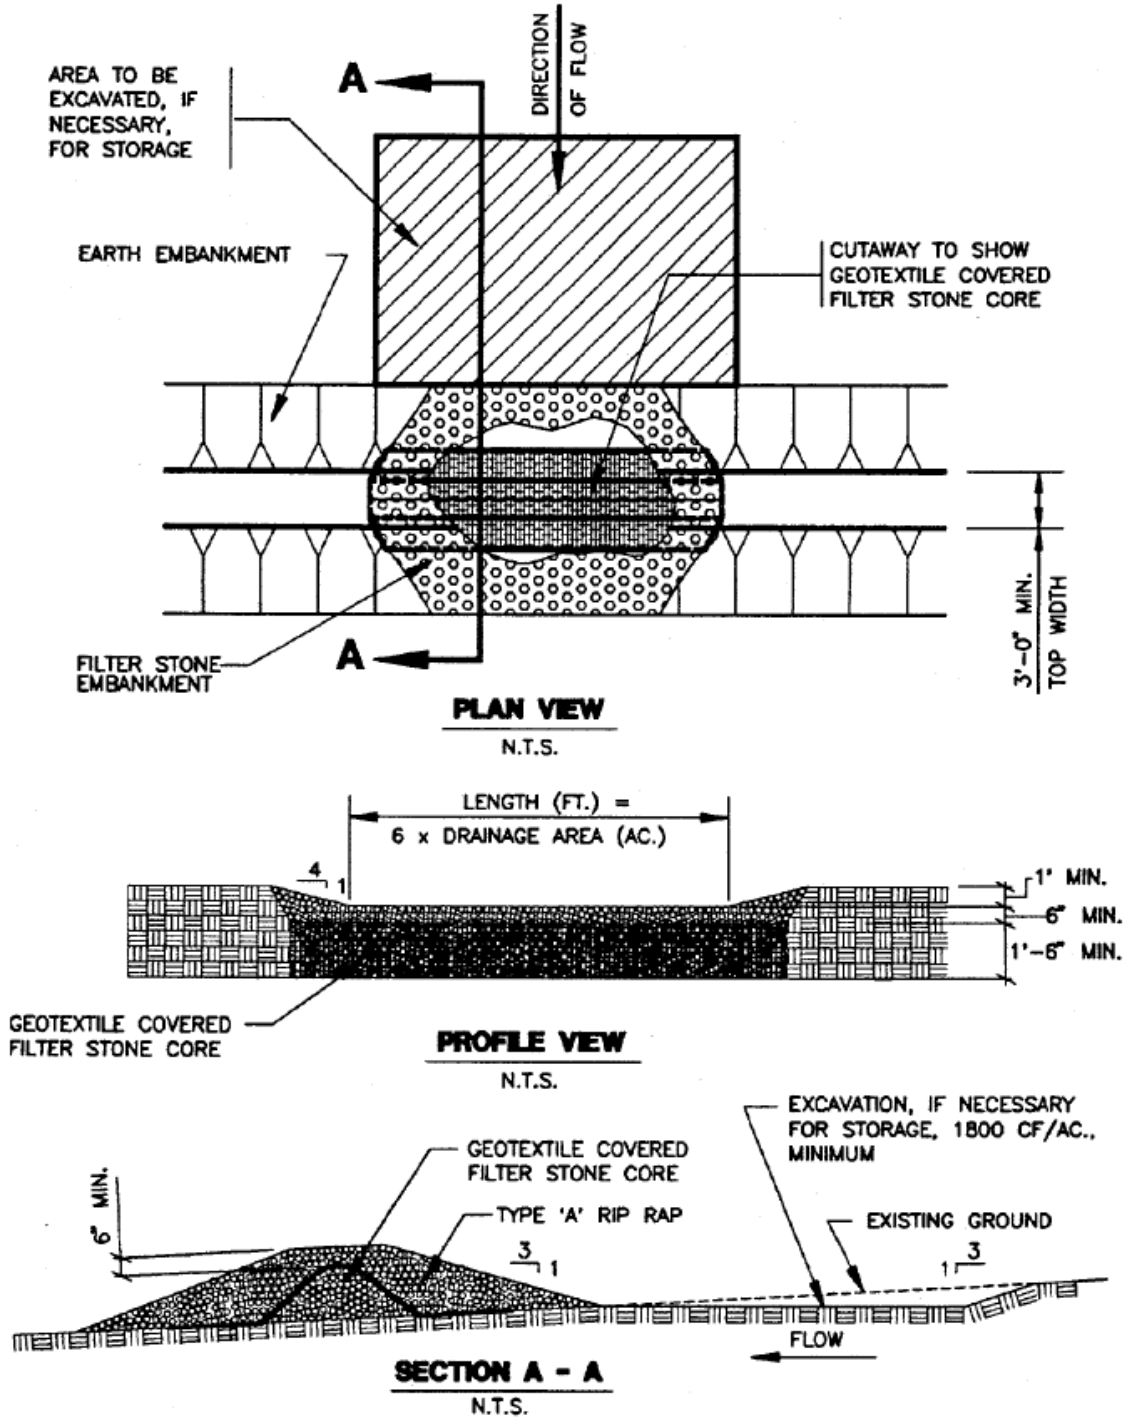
Stone Outlet Structure Installed in Conjunction with a Sediment Trap
